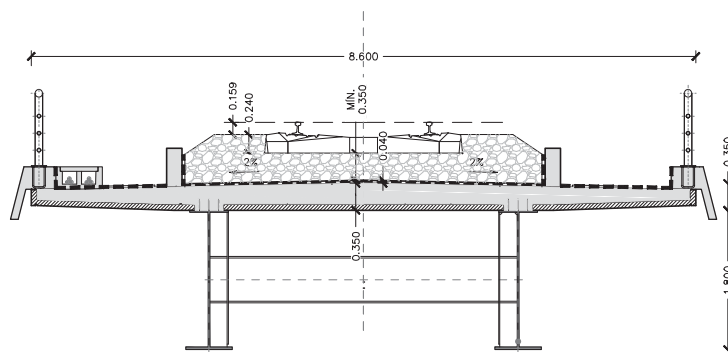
Tinajas Bridge deck cross section (Dimensions in [m]).
